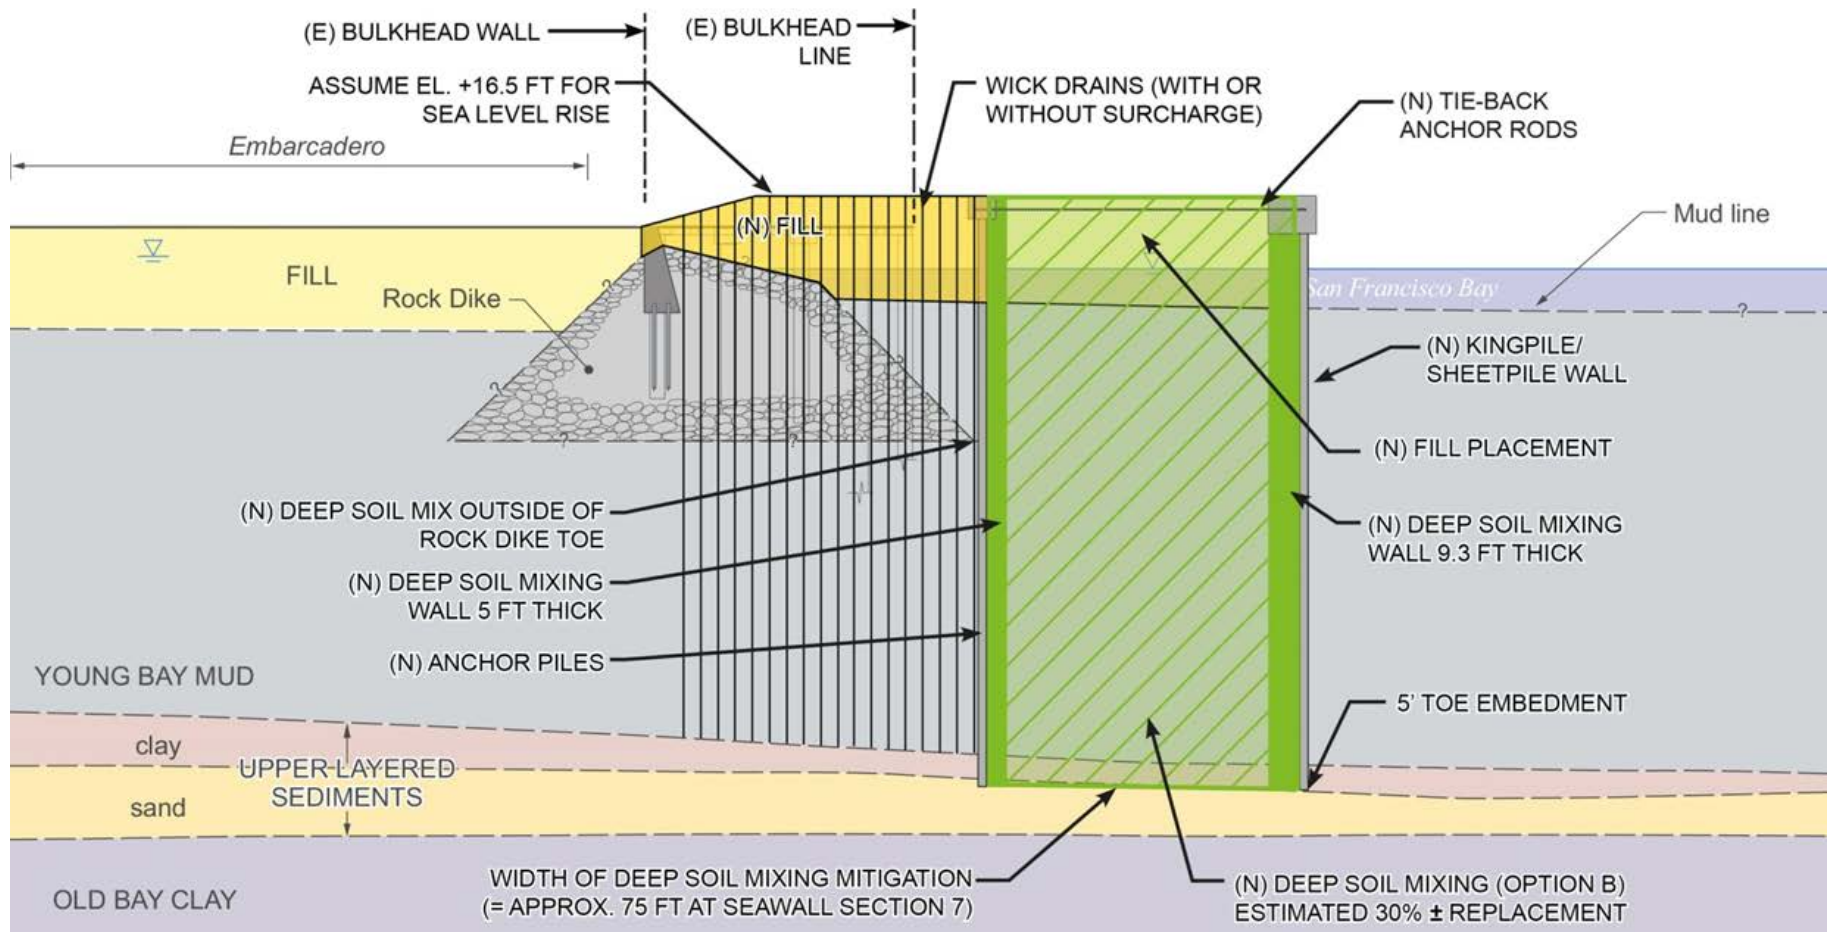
Soil Strengthening Alternative-Anchored Sheetpile & Deep Soil Mixing
